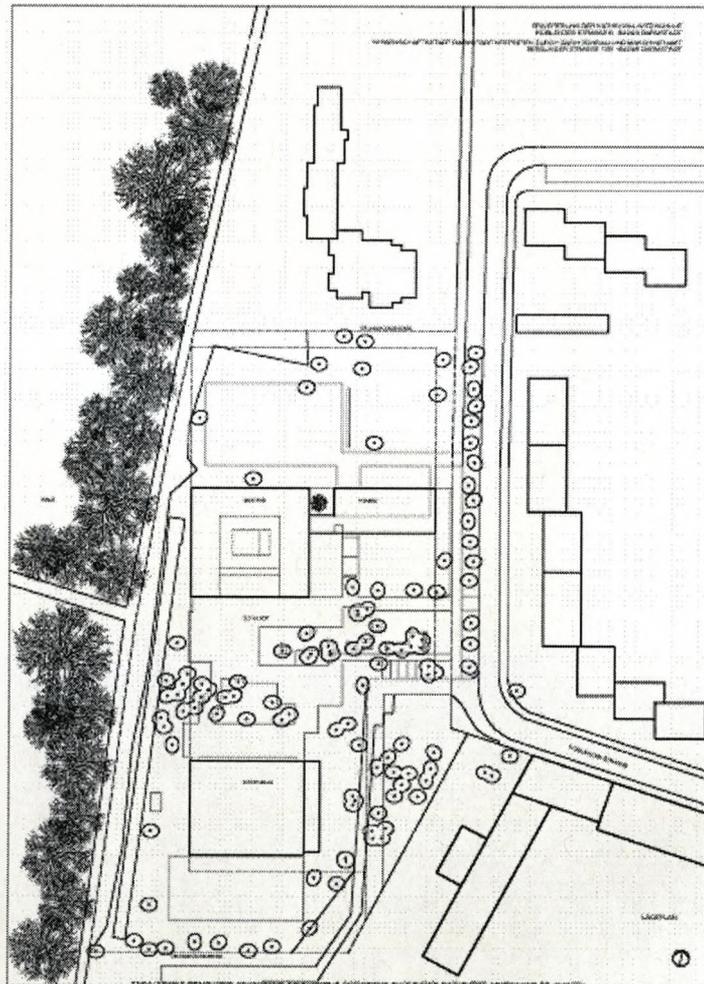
Extension to Käthe-Kollwitz Primary School in Darmstadt. Site plan (not to scale).
